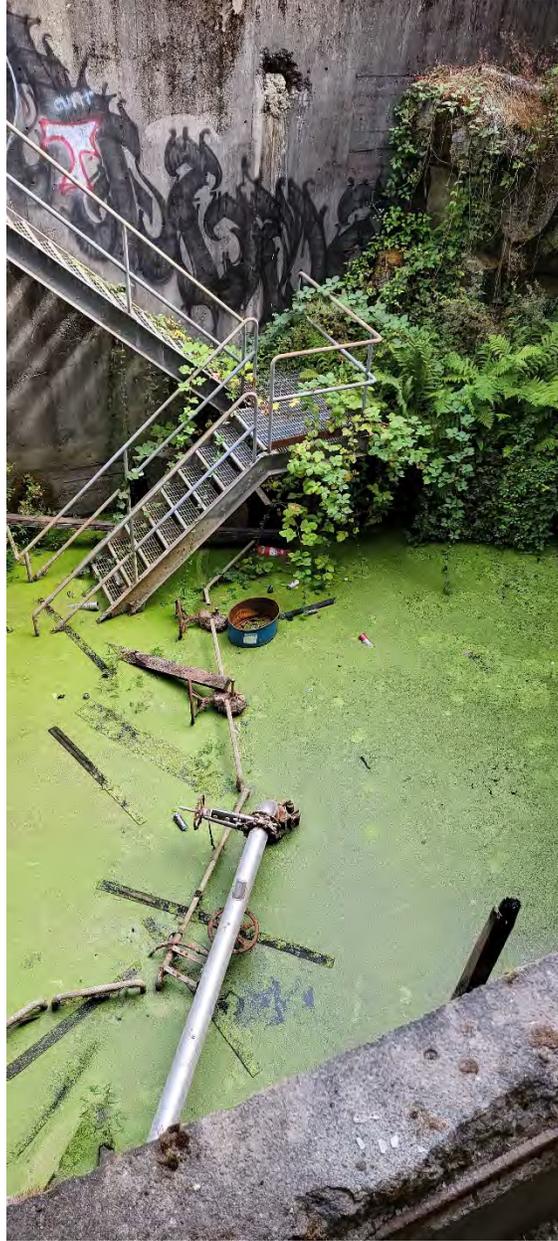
Millrace east of Building 27. Drum submerged in water (ID 27-D-220921-3).
